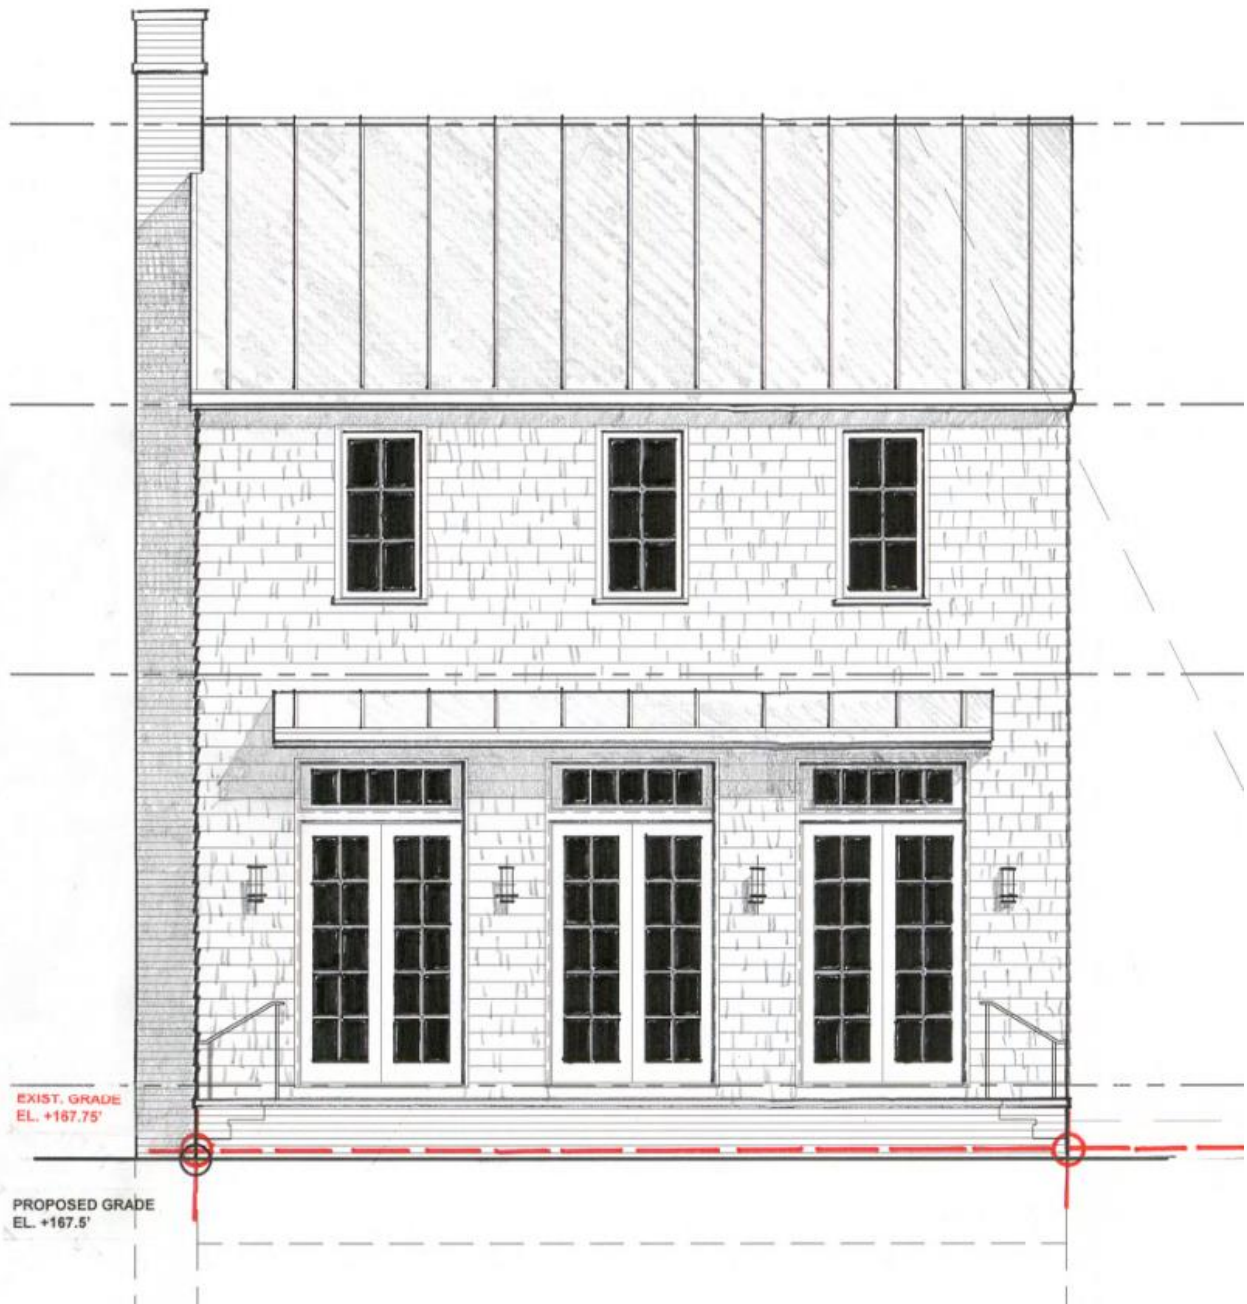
Secondary Front Elevation (Ridge Road Drive)
